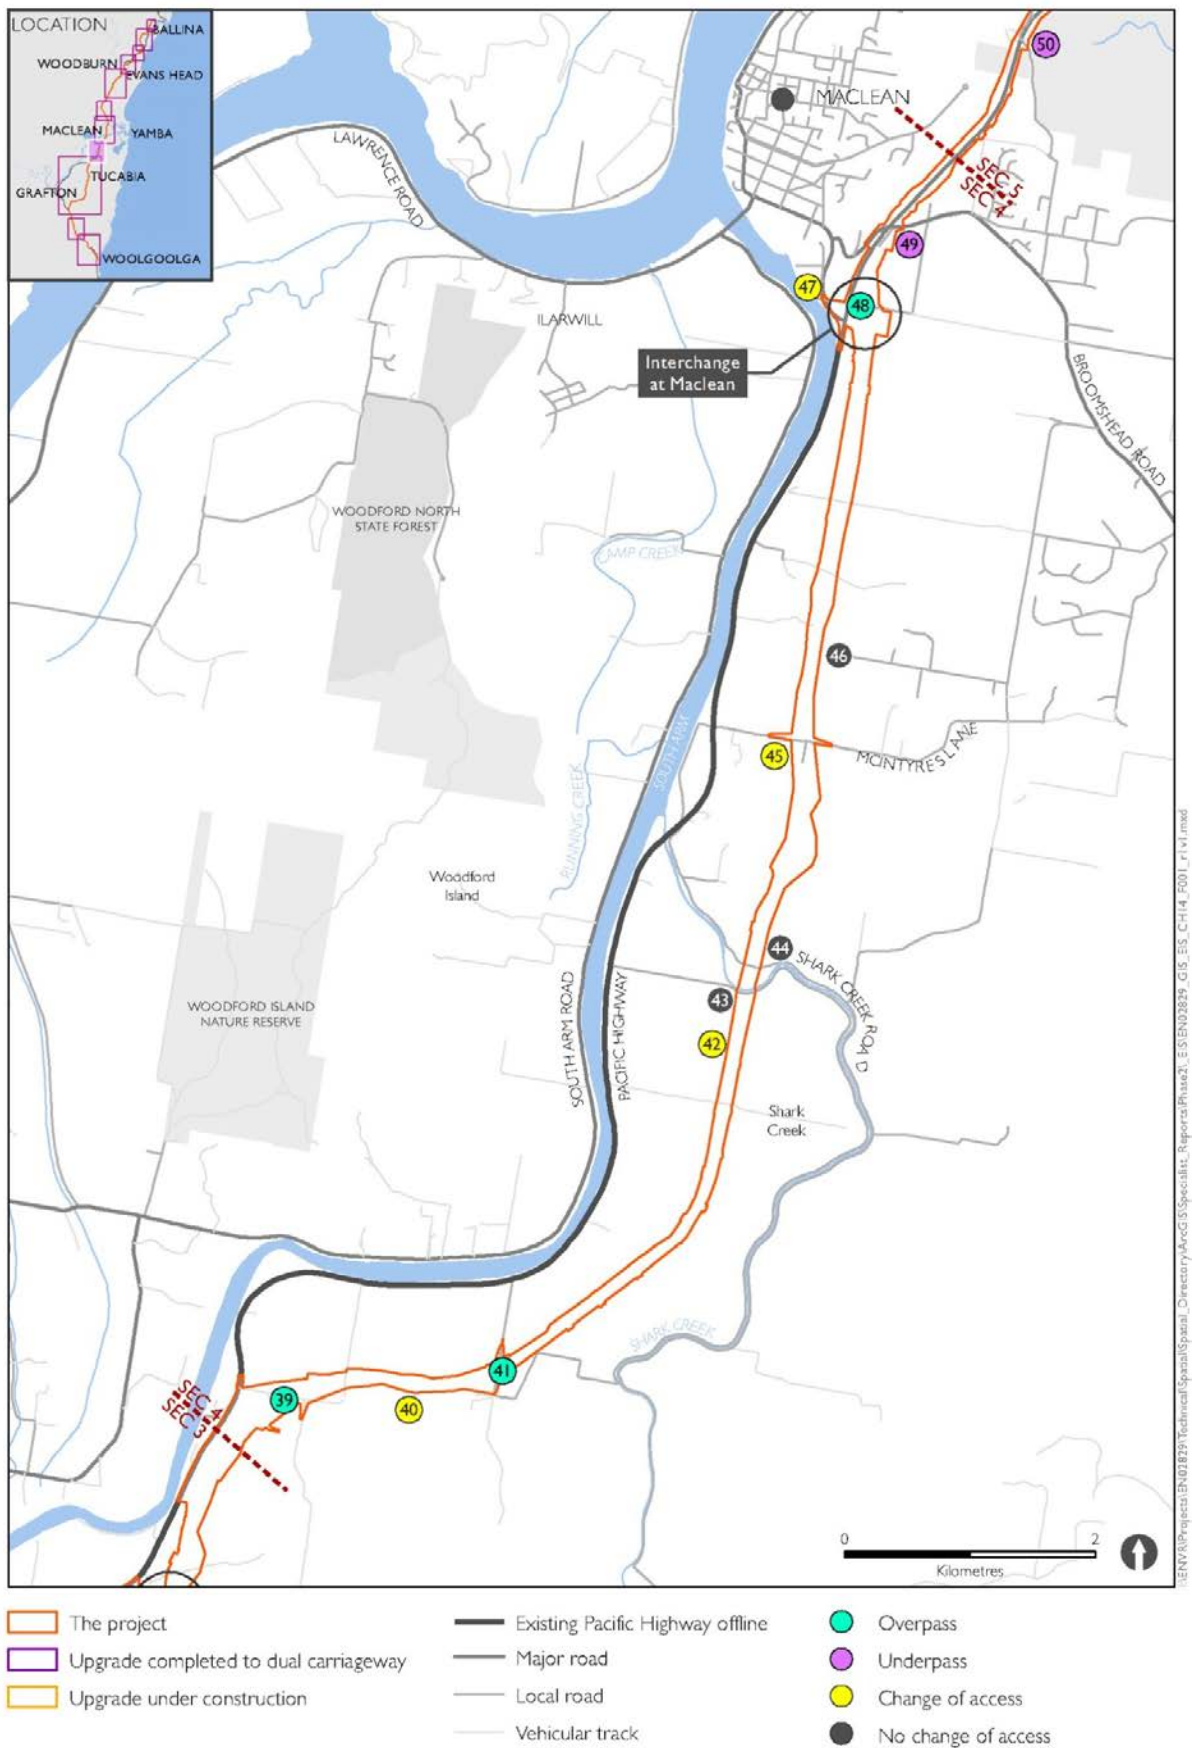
Locations of road alterations or changed access arrangements: Section 4
